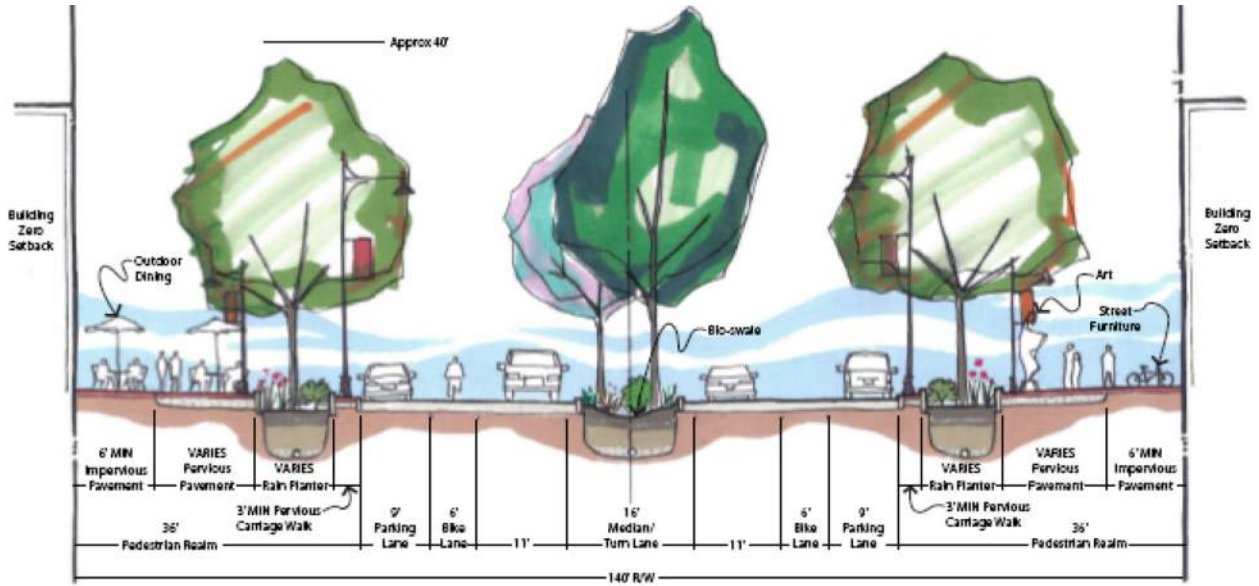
Woodson Terrace Comprehensive Plan Woodson Rd. Concept 1
